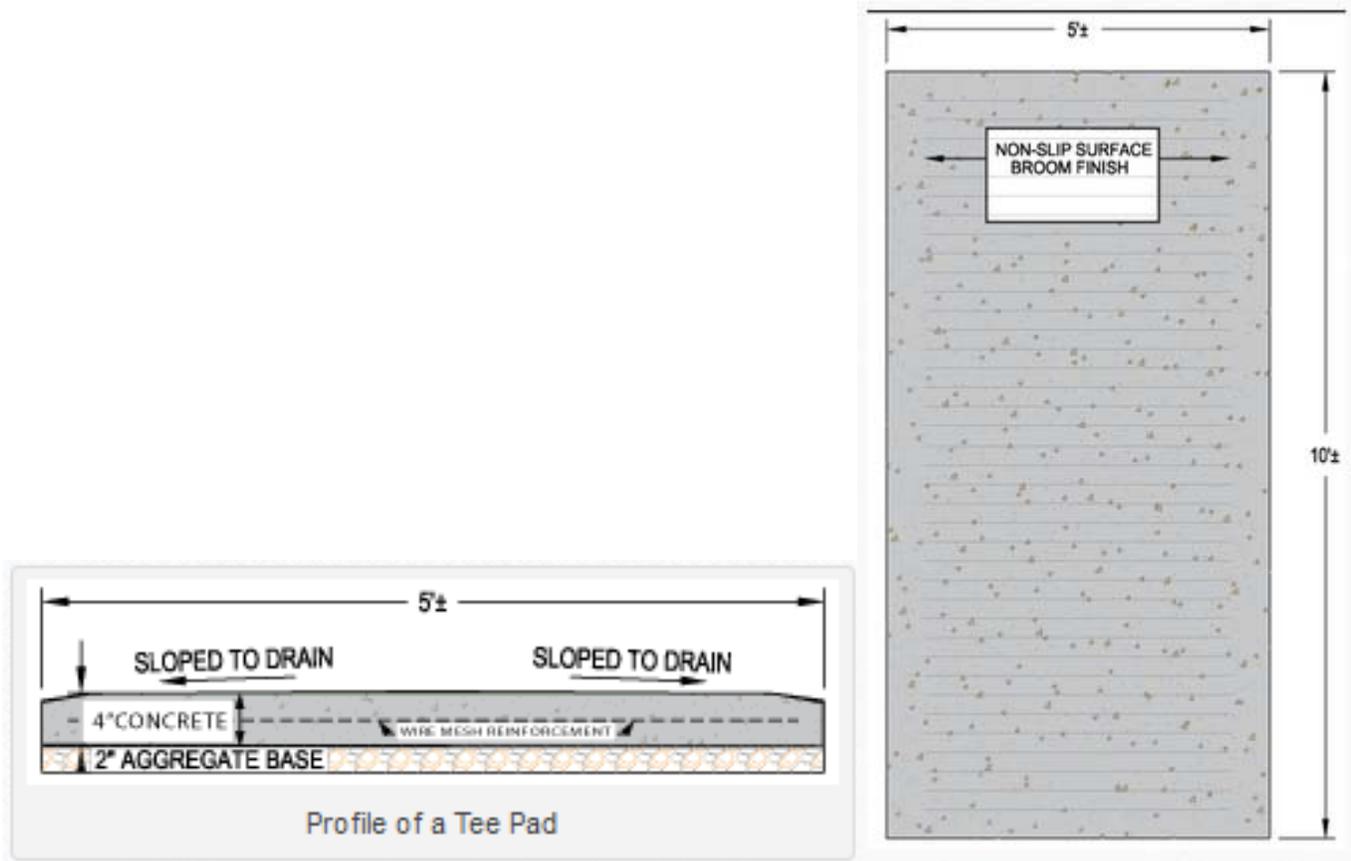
Proposed Dimensions for Tee Pad (DGA "Concrete Tee Pad Installation" 2014)
